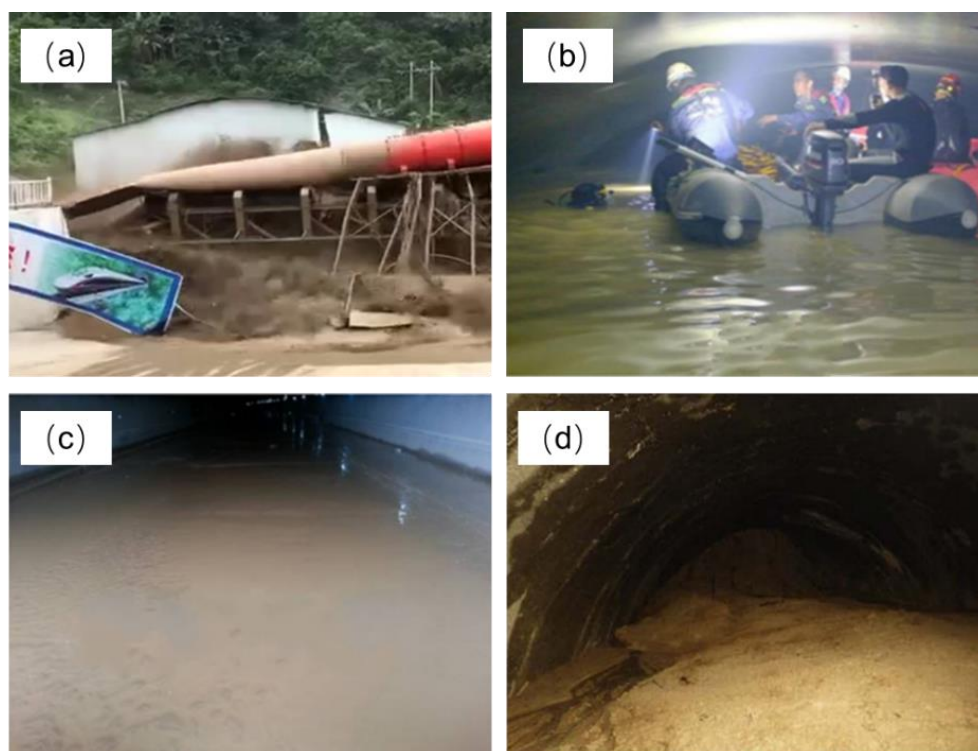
Water inrush in tunnels: (a) Chaoyang Tunnel [8]; (b) Shijingshan Tunnel [9]; (c) Shangjiawan Tunnel [10]; (d) Denghuozhai Tunnel [11].
